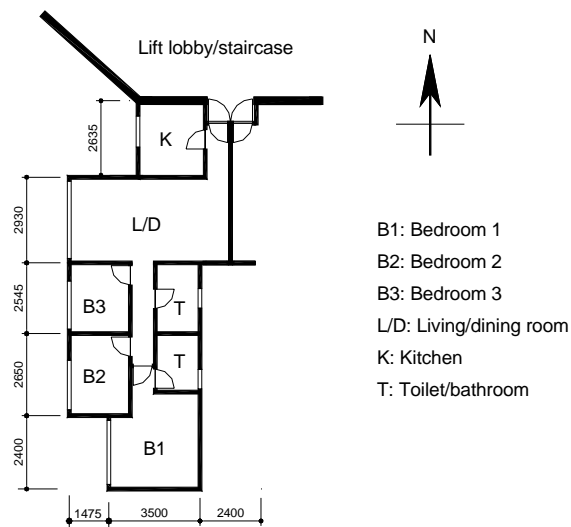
Floor plan of a west-facing apartment under study in a hypothetical high-rise residential building
